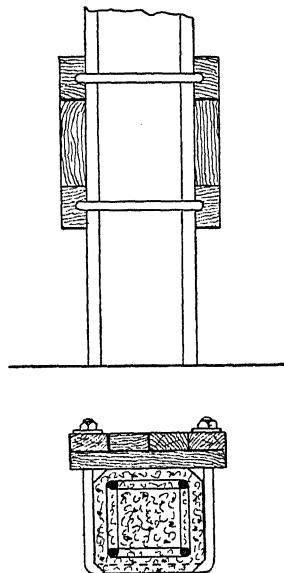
Method of obtaining Fixing to Ferro-concrete Column.
